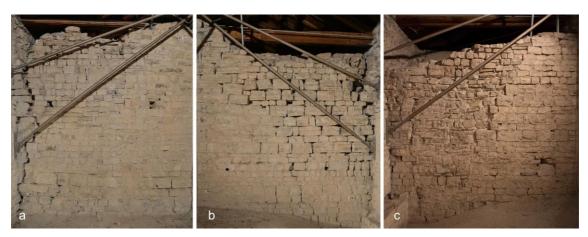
, 1b, 1c, - Damage on the north and south facades of the transept. Please note in picture 1c the rebuilt part with a later crack on the left side (author).
